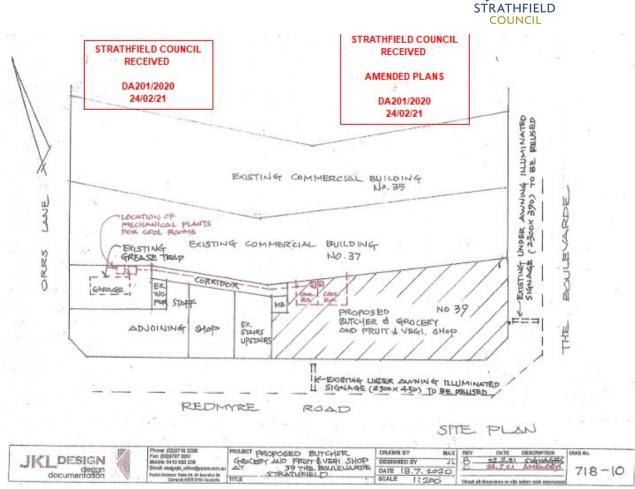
Signages Plan (showing location of mechanical plants for Cool Room
